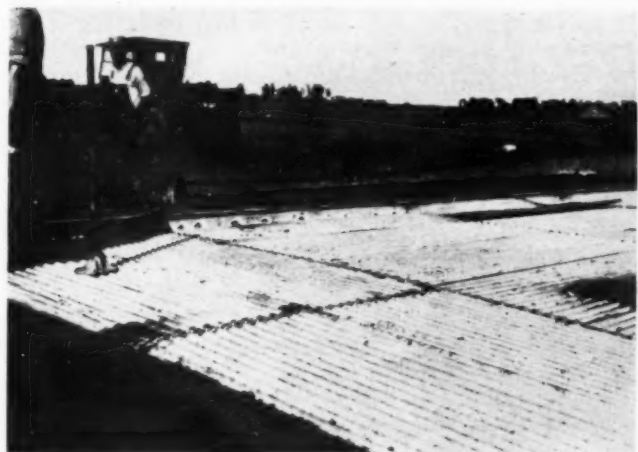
A View Showing Manner of Placing Plates in Sections A and B
